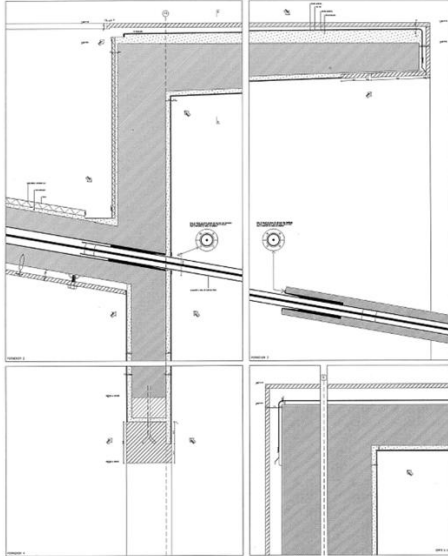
Portugal Pavilion, Cross-section. Structural System Scheme showing Steel Cables embedded within the Concrete Slab
